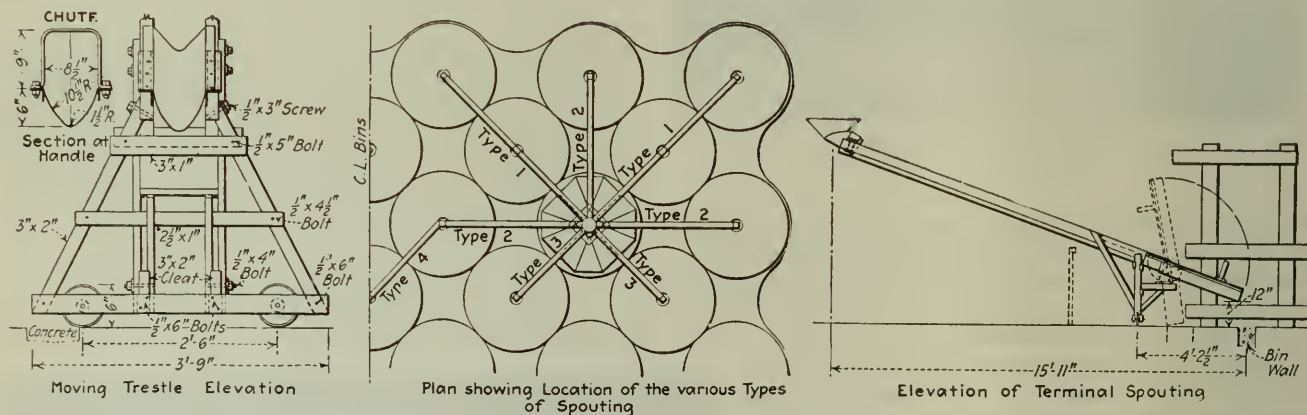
TERMINAL TIMBER TREESTLE IS OF BICYCLE TYPE—TRUSSED BEAMS OF VARIOUS TYPES IN CONCRETE HANDLING—CHUTE DETAIL SHOWS DEEP CROSS-SECTION
